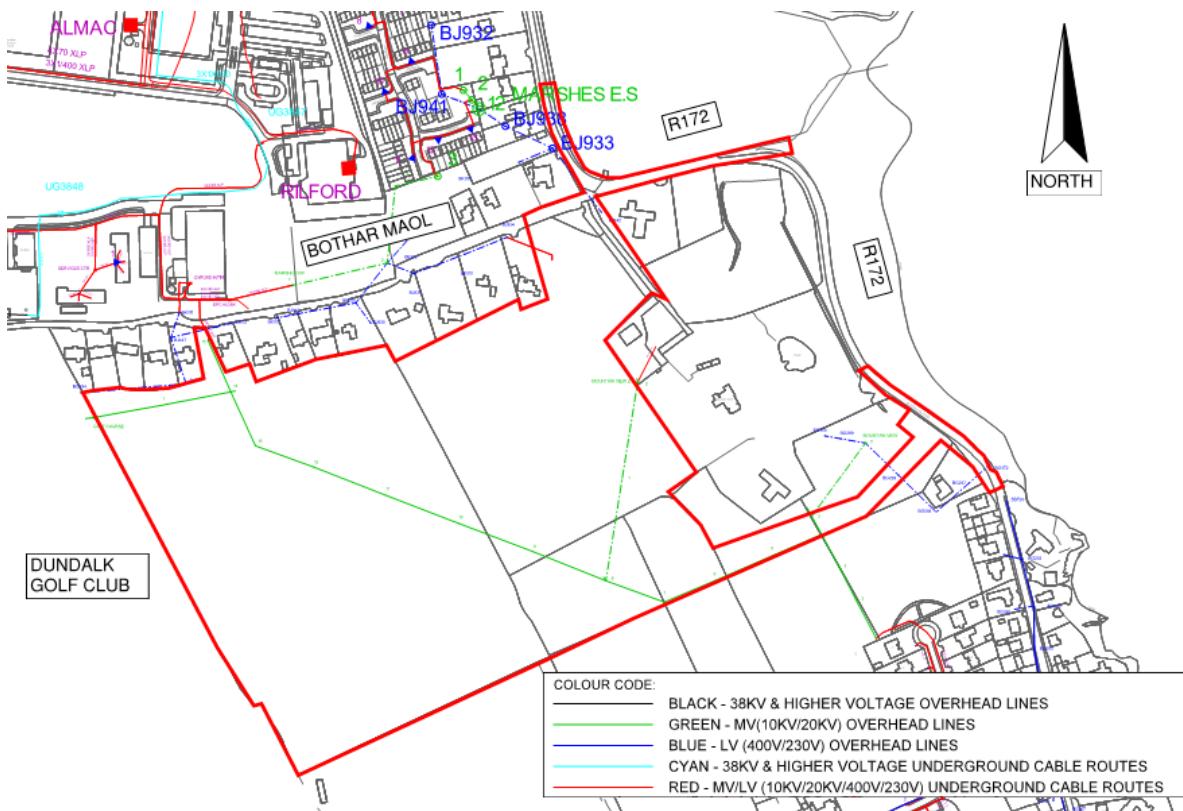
Existing ESB infrastructure of relevance to the subject site (Source: ESB)
